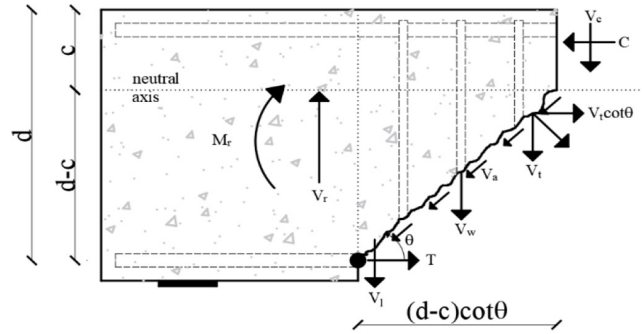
Shear contributing actions at failure for RC elements with stirrups
